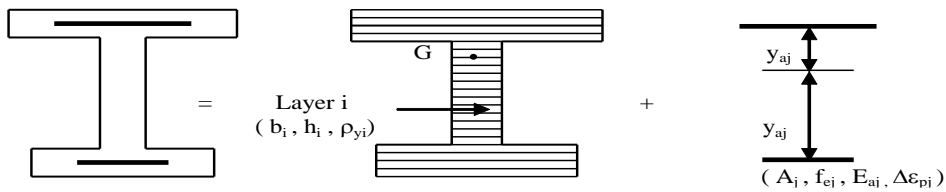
Section discretised into concrete strips and longitudinal steel components.
